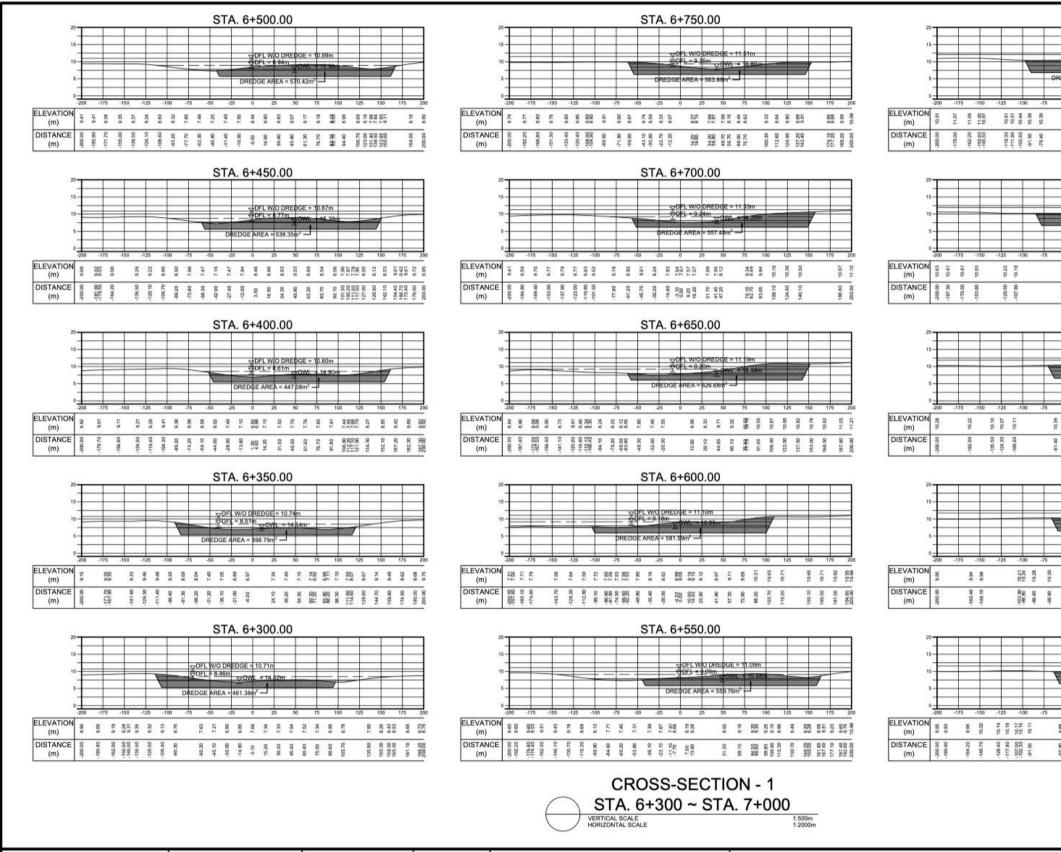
Design Cross Section-1: Sta 6+300 to Sta 7+000
